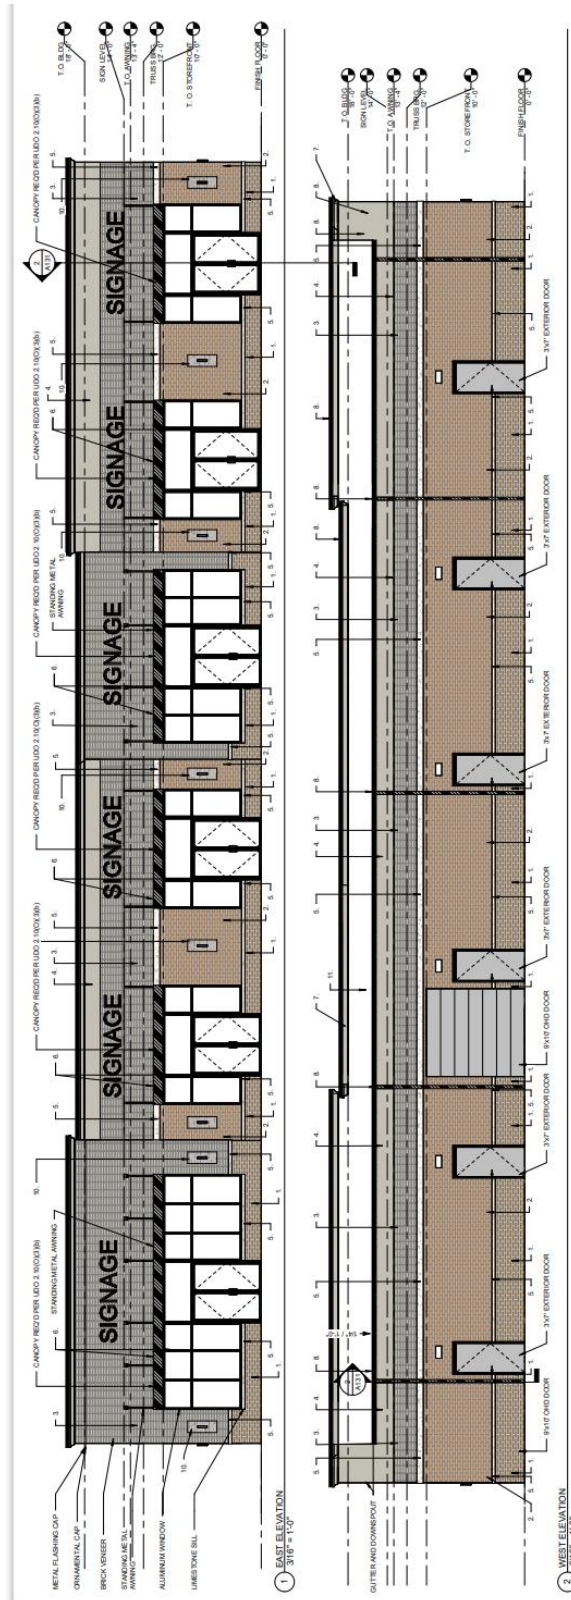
Exhibit D – Revised Building Elevations (6-Feb-2026) (Sides & Trash Enclosure)
